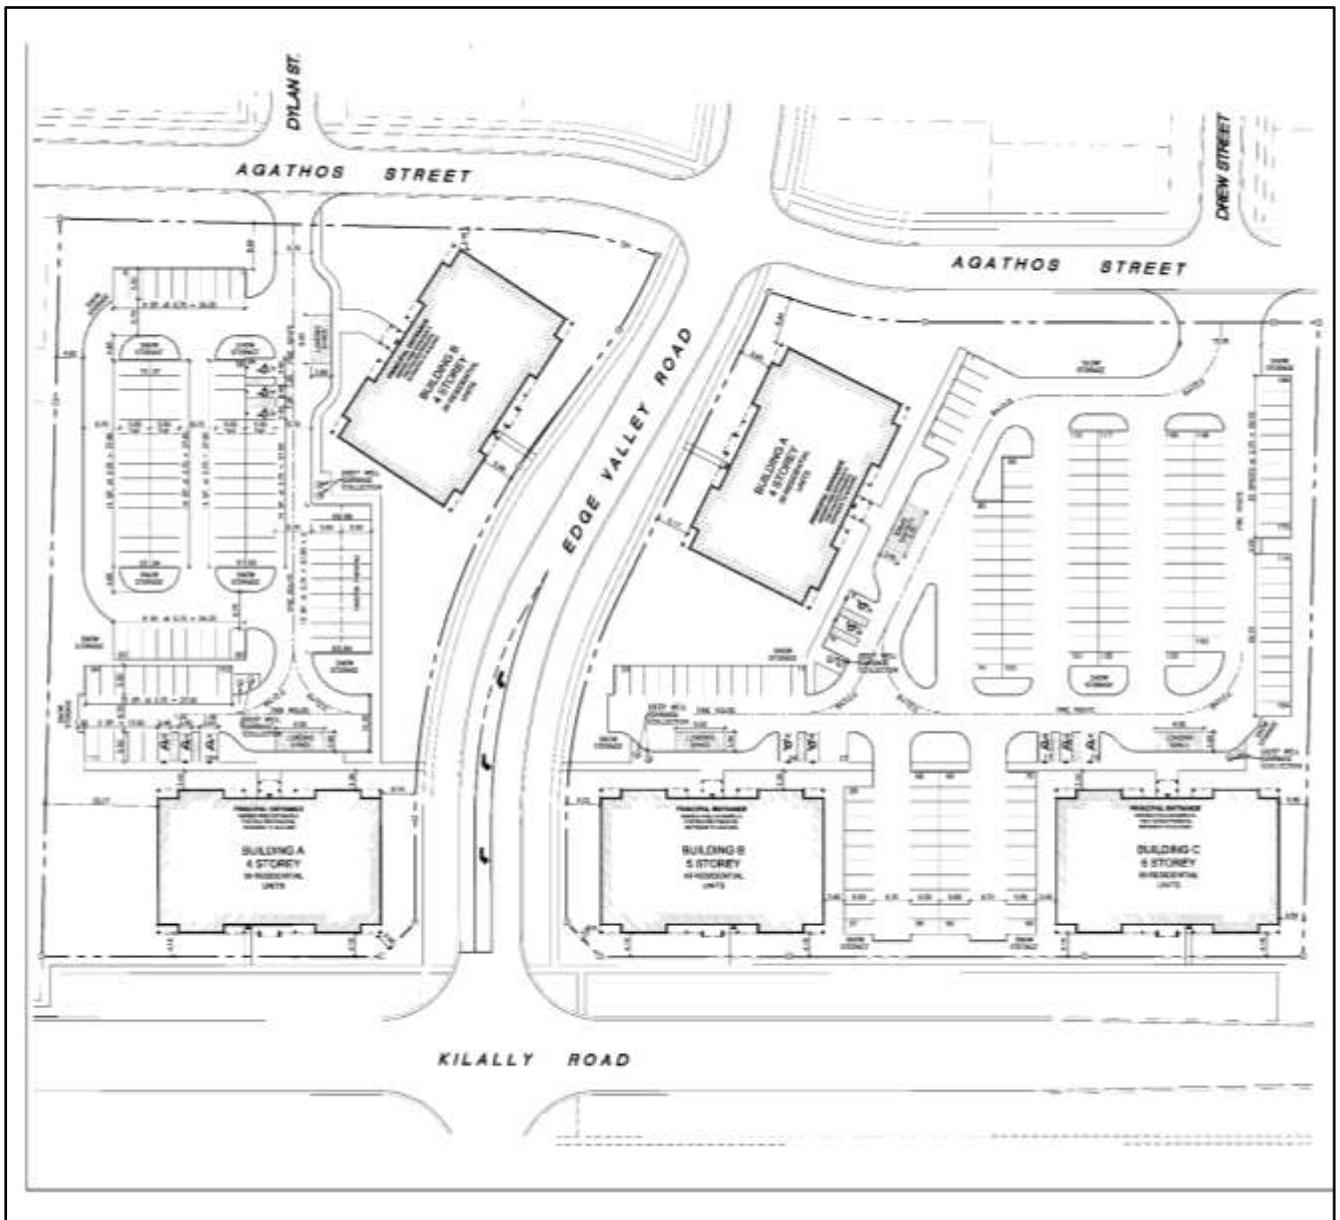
Proposed Site Plan (revised as of August 16, 2019) for 475 and 480 Edgevalley Road
